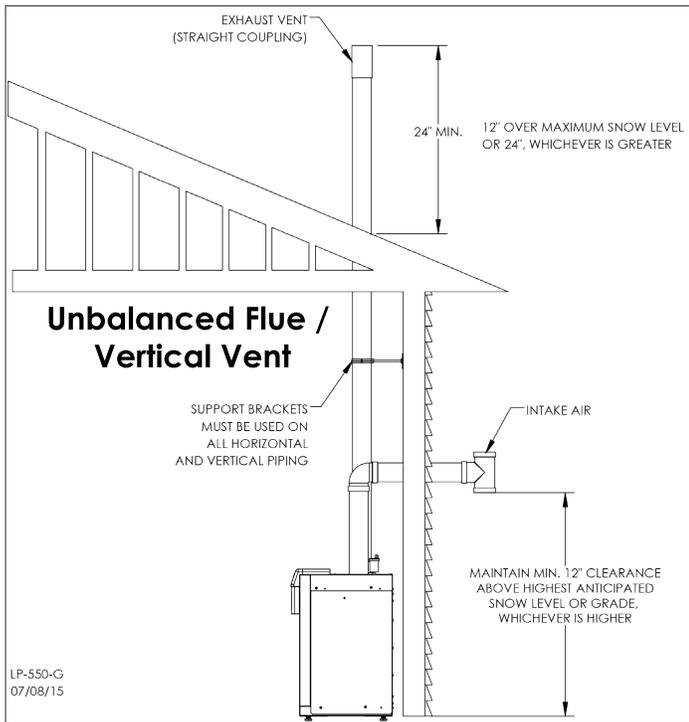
Unbalanced Venting - Roof Exhaust and Sidewall Intake
